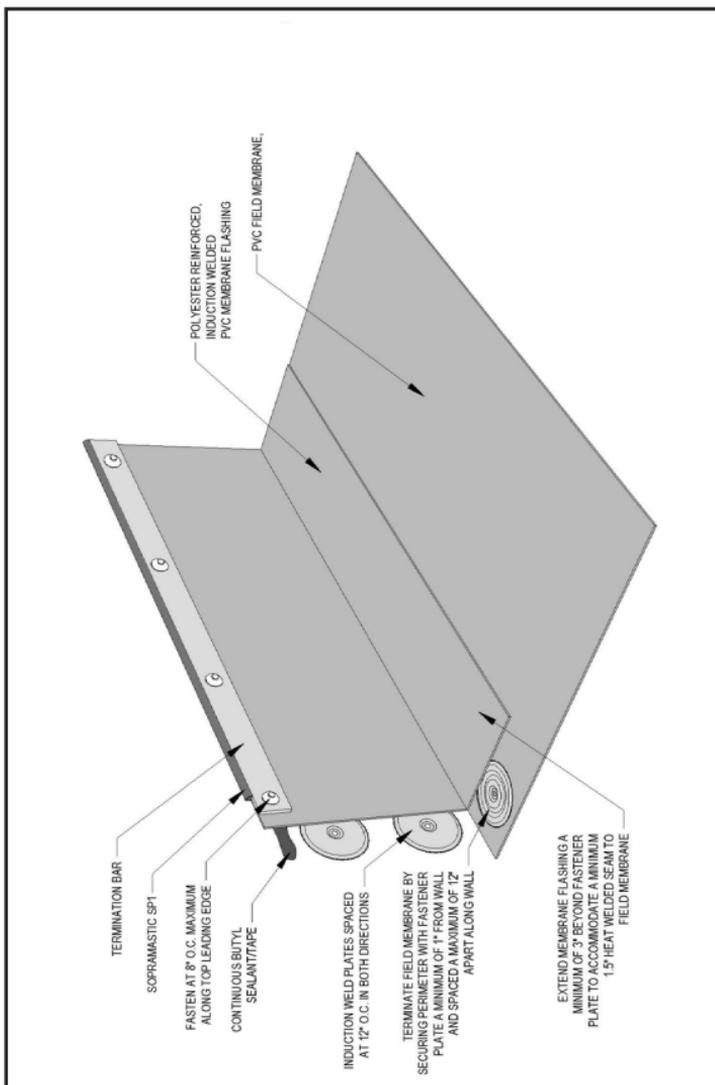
Induction Welded PVC Flashing Membrane At Wall/Curb With Horizontal Perimeter Fastening
